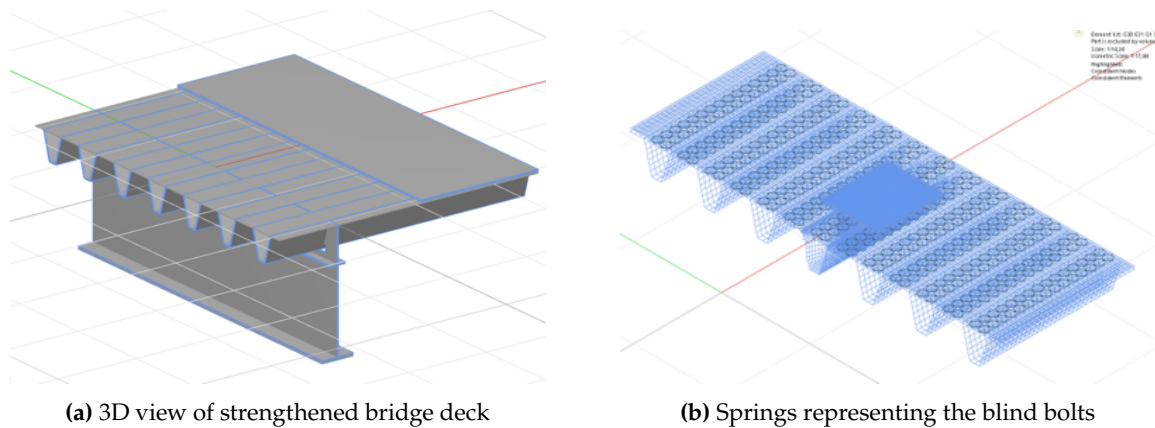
Visualisation of strengthened bridge deck for detail 2b
